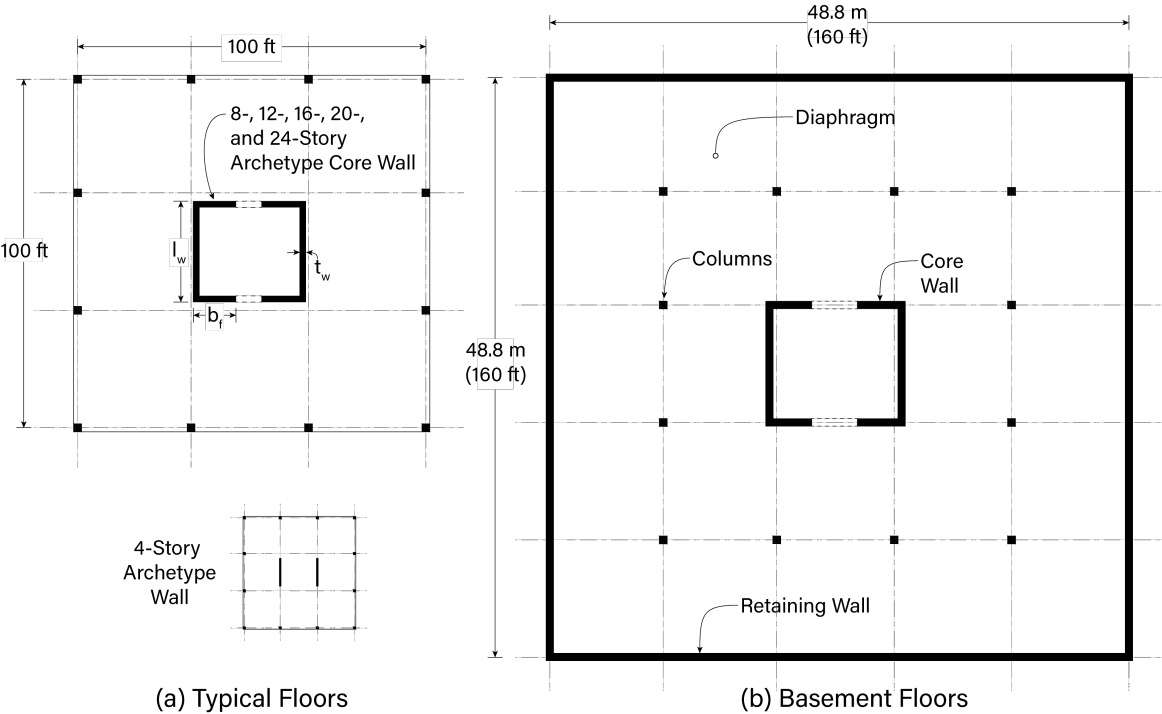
Plan view of archetypes at: (a) typical floors and (b) basement floors.
